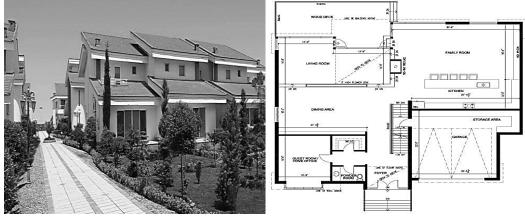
Plan and Elevation of a Typical House in Kish Island
